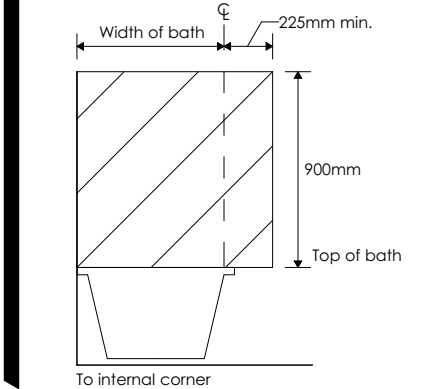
CONT. BELOW LOCATION OF SHEETING FOR WALLS SURROUNDING A BATH
